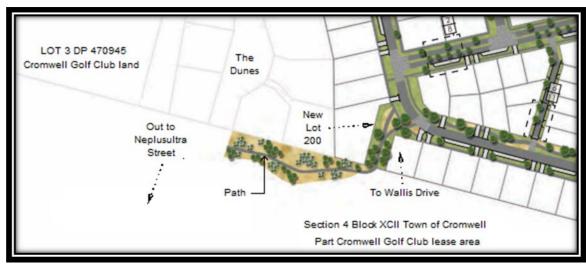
Extract of subdivision landscaping plan with path through Golf Club
